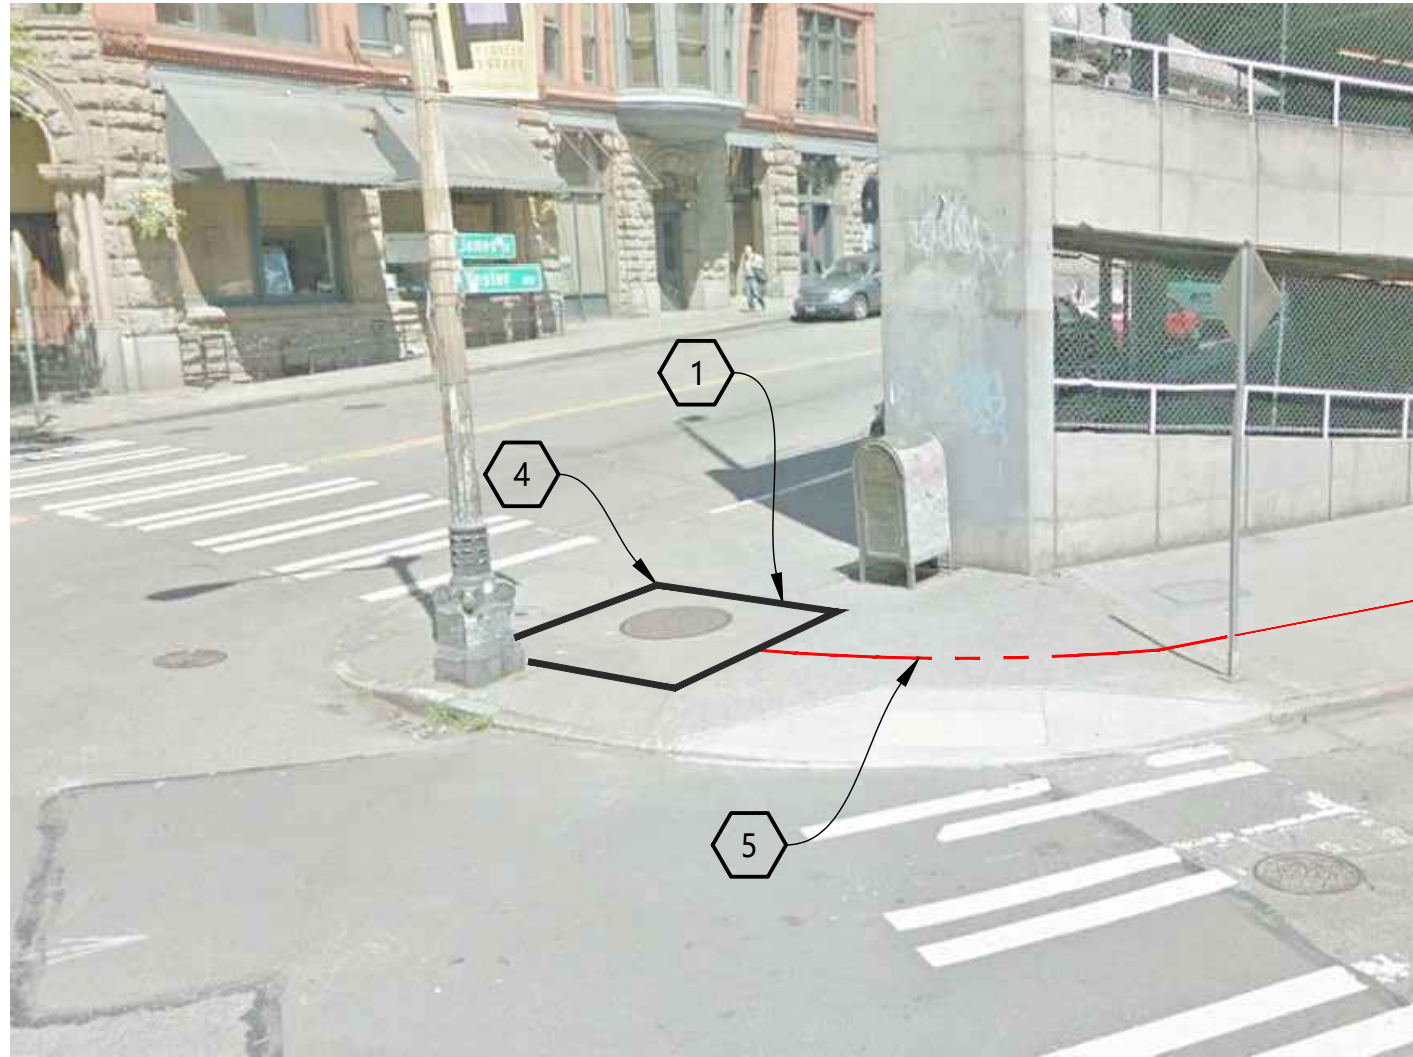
FACING EAST ON NORTH SIDE OF YESSLER WAY
